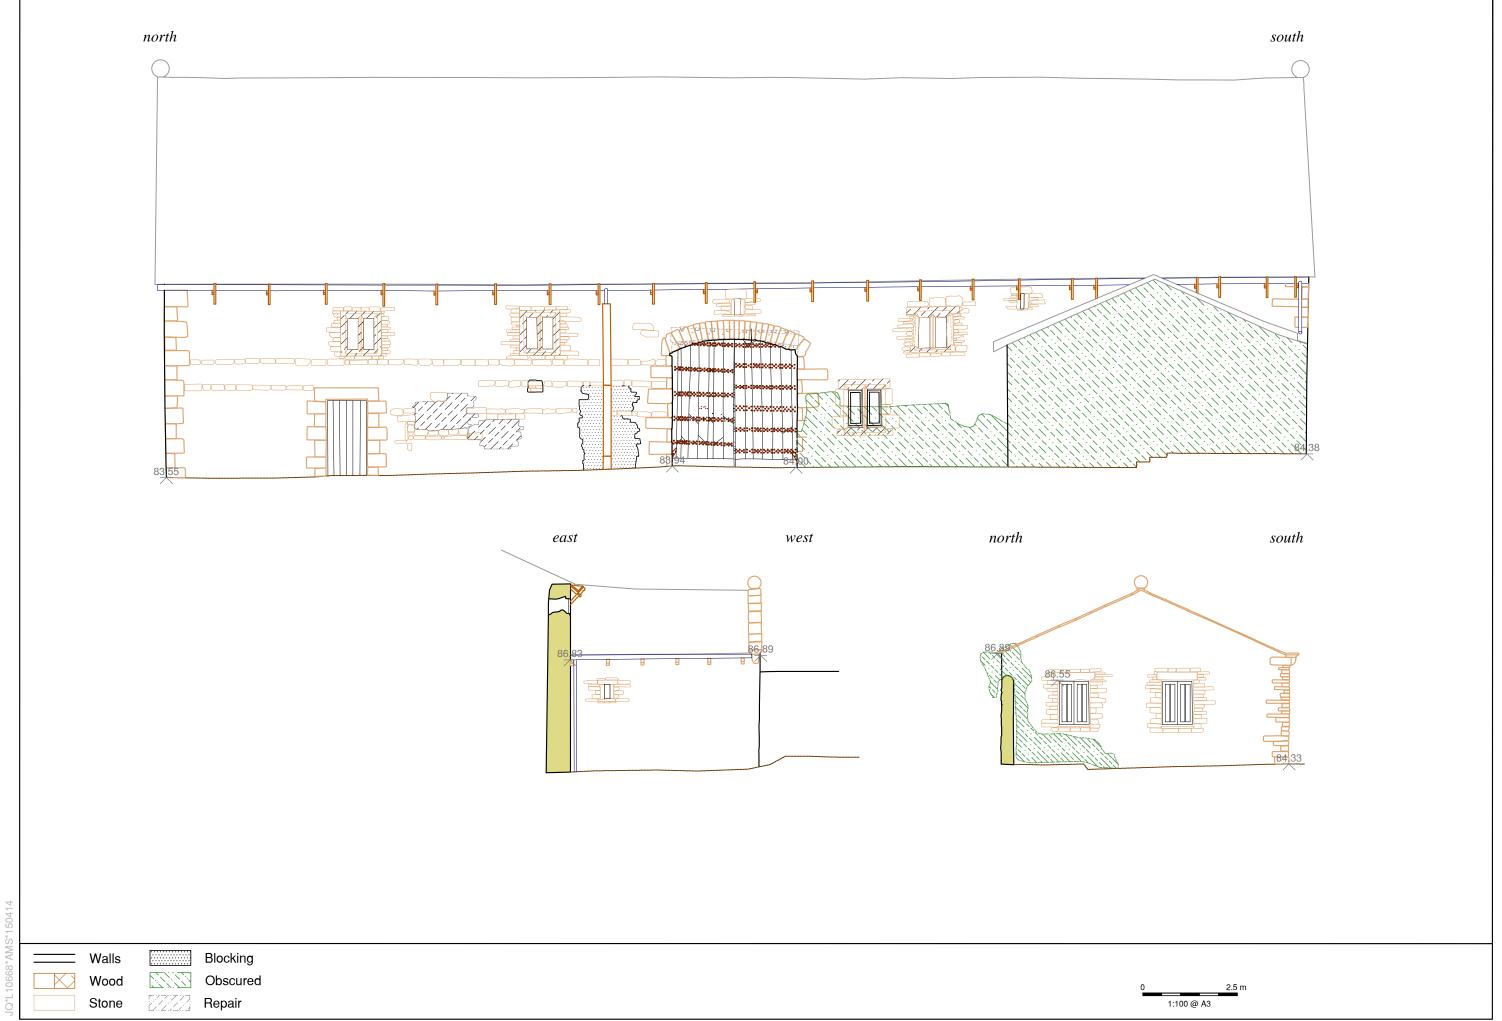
West-facing external elevation of Gawthorpe Barn and the west- / north-facing elevations of the Toilet Block
